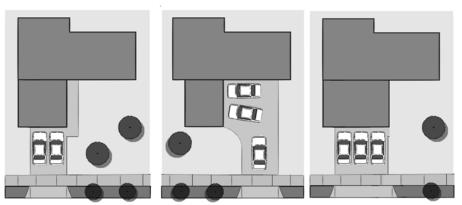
18 – Examples of Allowed Parking on Driveways
